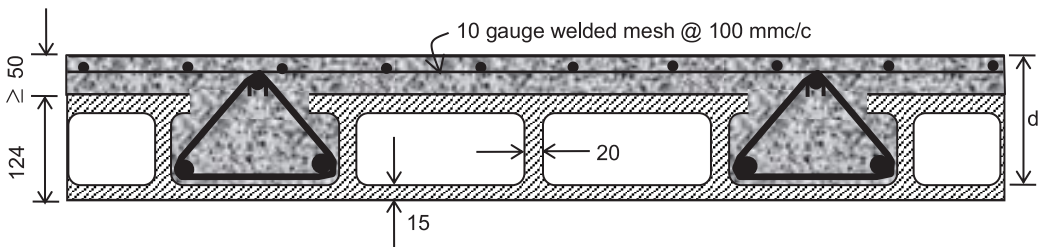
Typical cross section of panel with concealed beams and screed concrete
